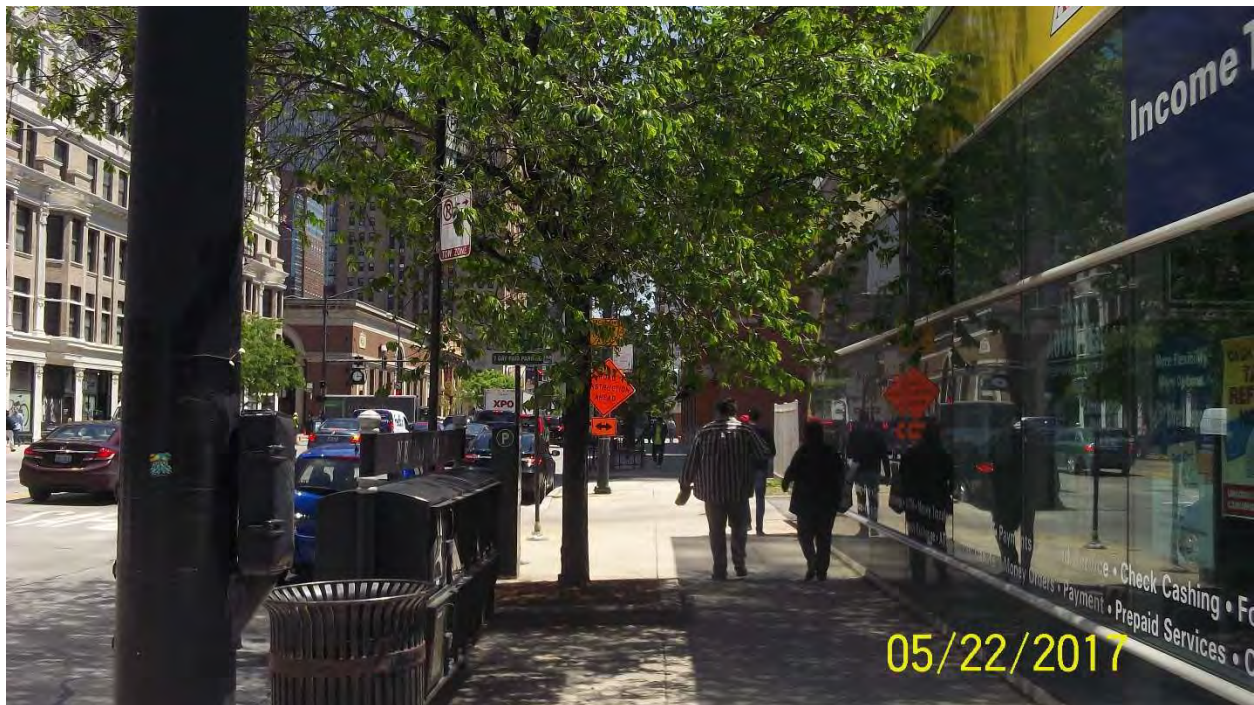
Southeast corner of Chicago Ave. / LaSalle St. – Looking East
